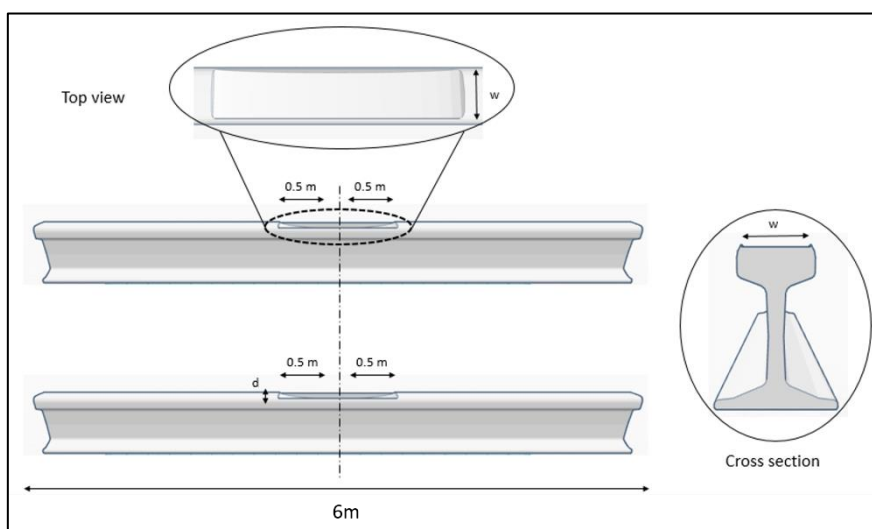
Schematic illustration of the material removal from rail surface by milling
